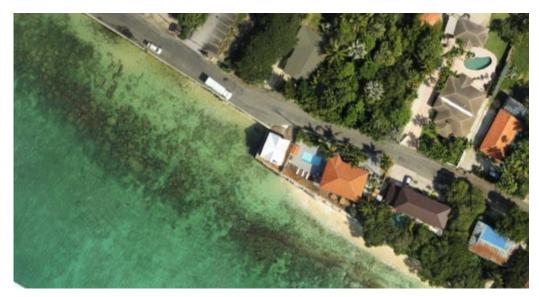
The site in July 2012 shows there was no beach directly in front of the property. The top of the seawall does not appear to be level when compared with previous photos, and the seawall footings are exposed, indicating there may be impacts to the structural integrity of the wall only two years after construction, and prior to the construction of any structures.
